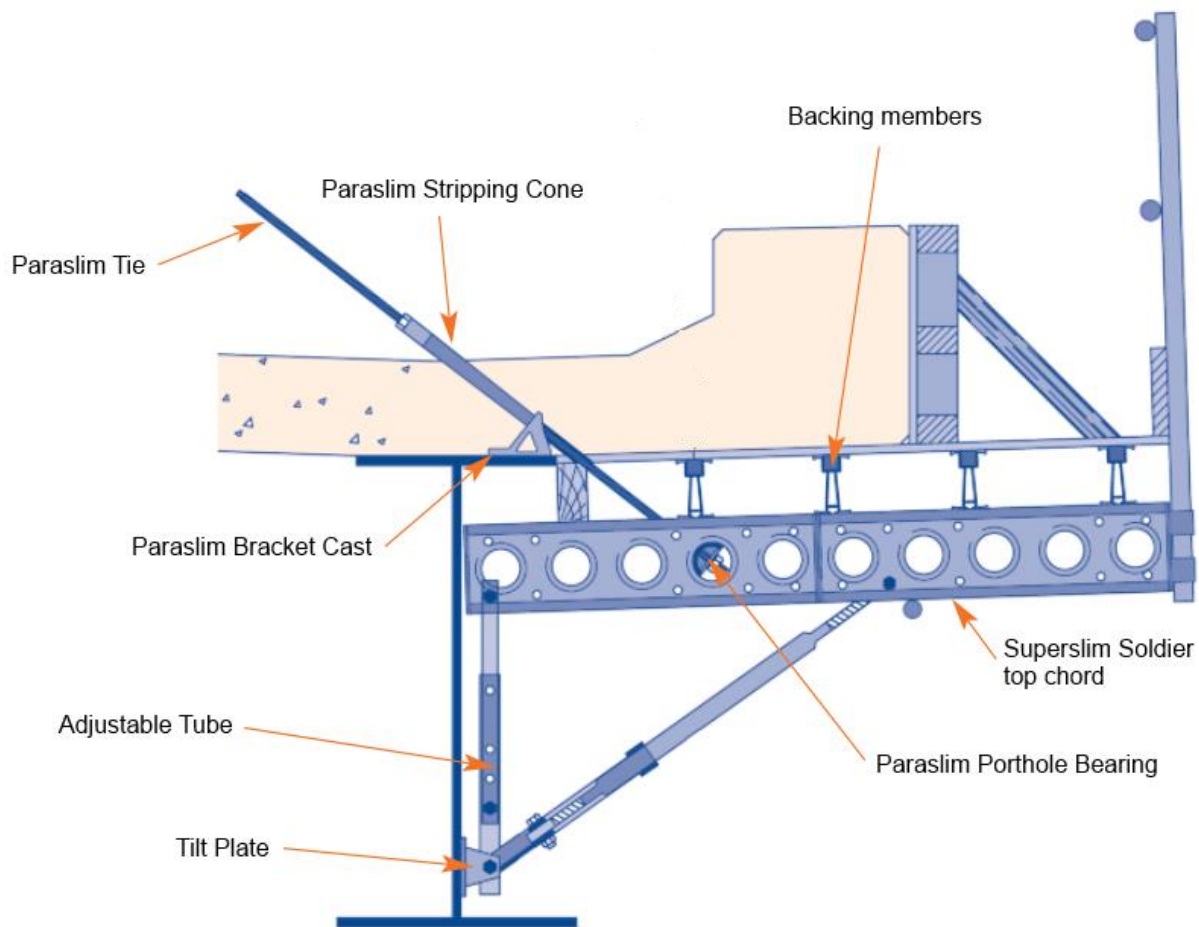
Section of a Paraslim module attached to a steel girder. Modified figure from (RMD Kwikform, u.d.)
